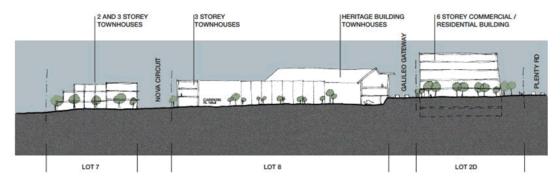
Indicative north-east to South-west Section: Plenty Road to Sanctuary Drive
